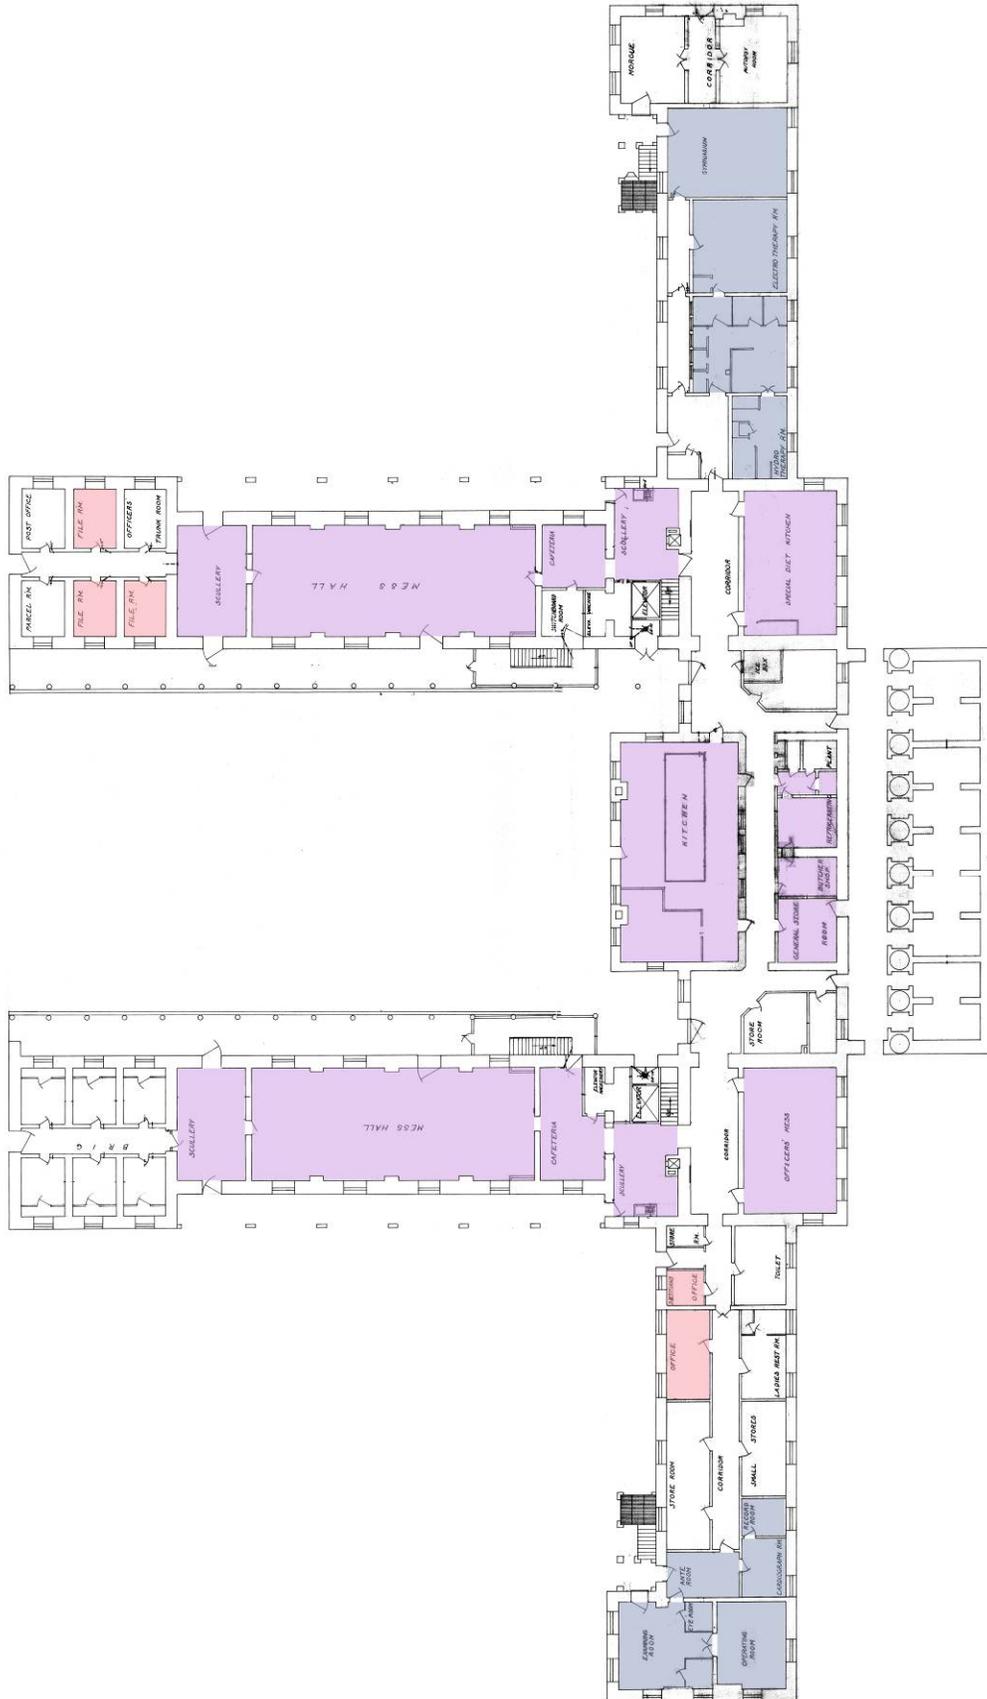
Ground floor plan of Naval Hospital Portsmouth, Virginia, circa 1927 (NARA College Park, RG 71-551-31).
